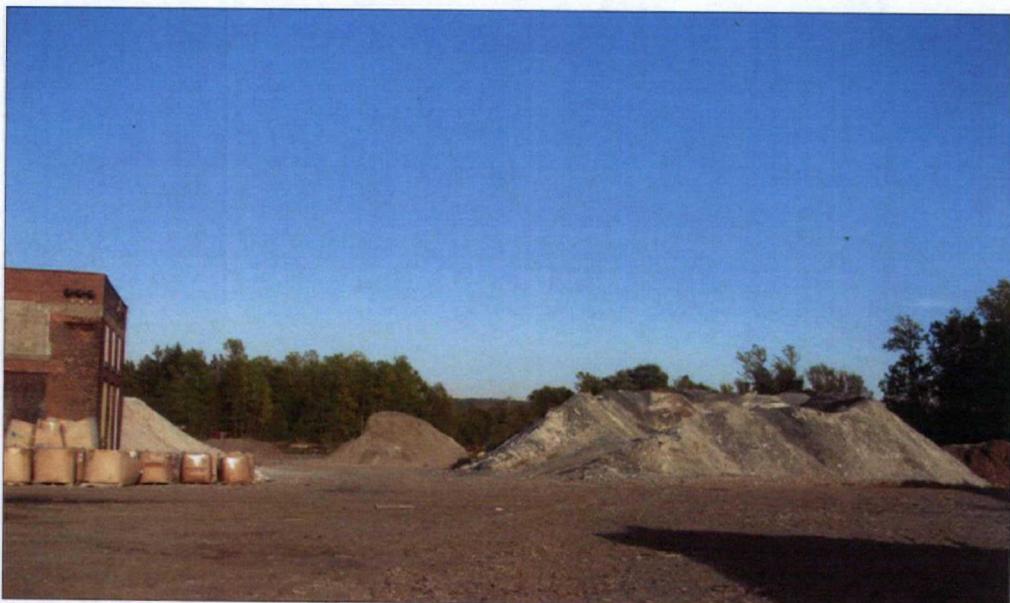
A view of Hillcrest Recycling facility facing east and located northeast of the burning stockpile taken on 09/12/12 at 1817 hrs.
